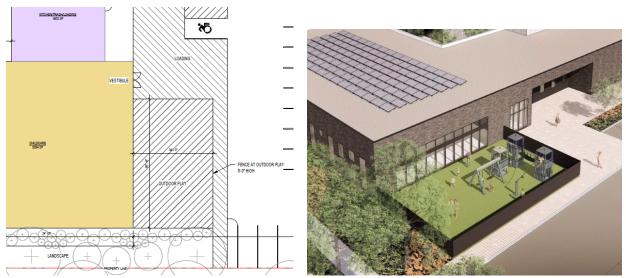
Submitted Plans for Outdoor Playground at 24-Hour Childcare Center (Site 2).
